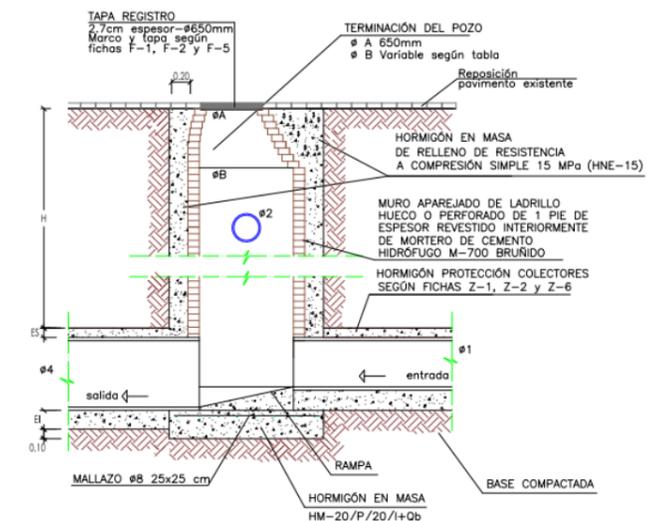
Brickwork manhole type elevation. Source: Ayuntamiento de Valencia, 2015
